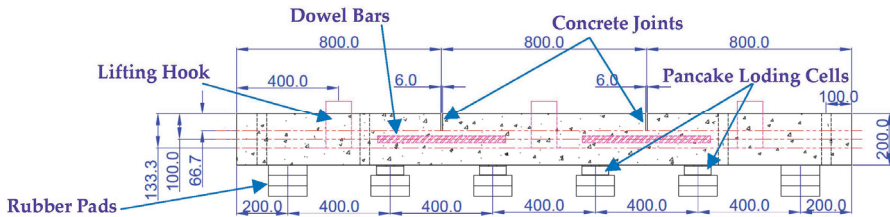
Slab Side View of the Concrete Slab Specimen with Dimensions in mm.
